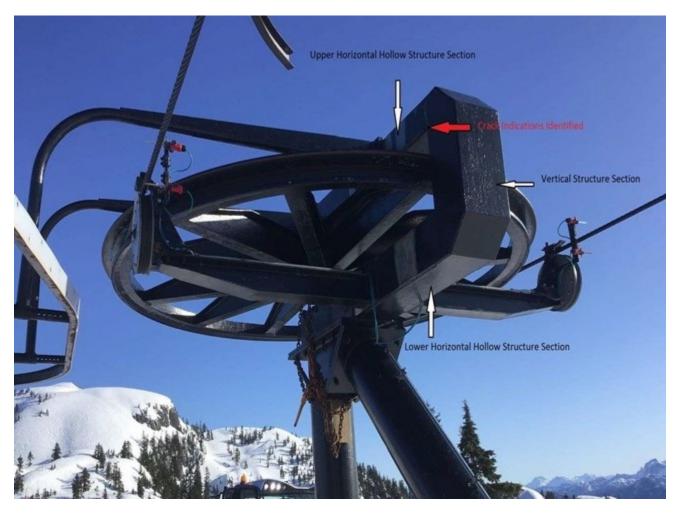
, Bull Wheel F Frame Labeled, Guide Sheaves Shown in Photo
